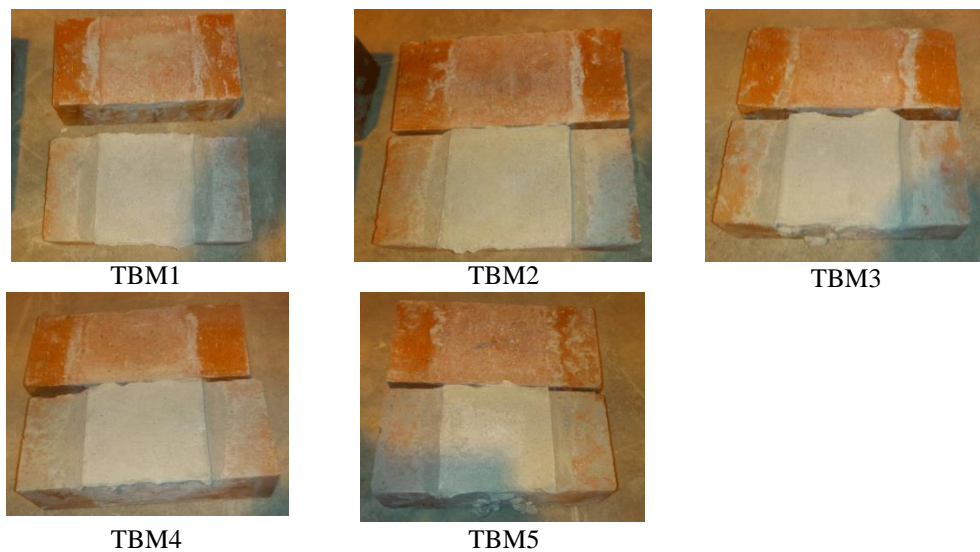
Crossed brick couplet tests specimens at failure under tension
